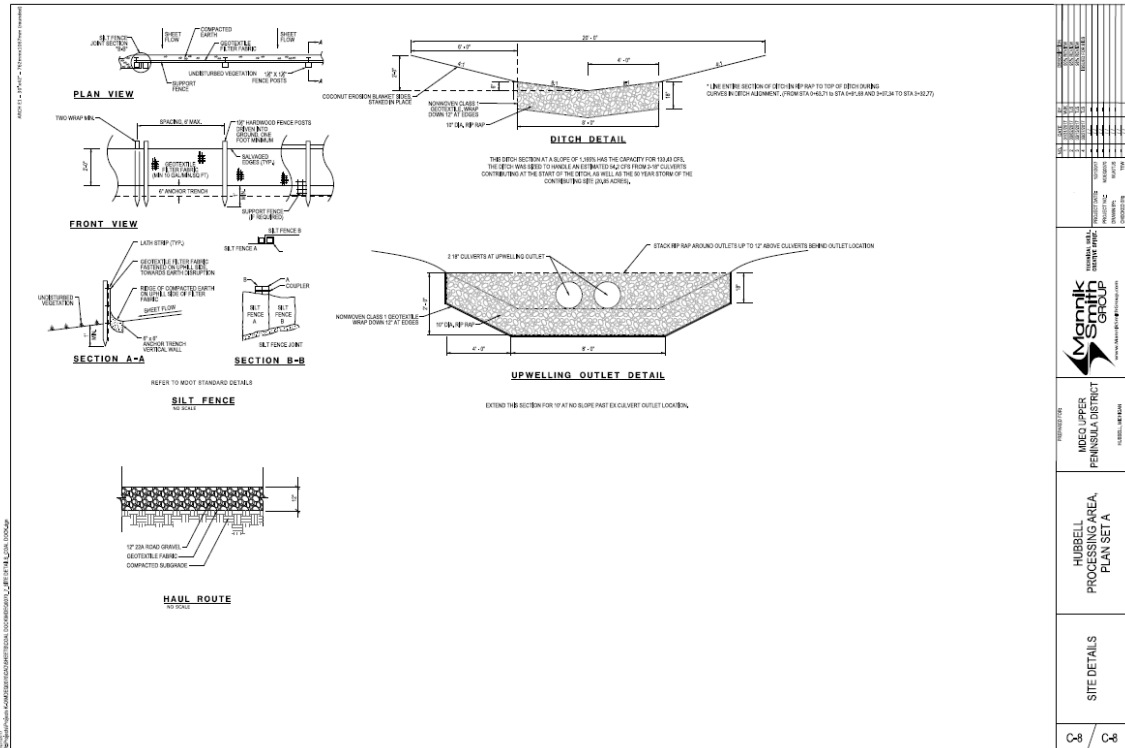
MSG Hubbell Processing Area Drainage Ditch Site Details [18].
